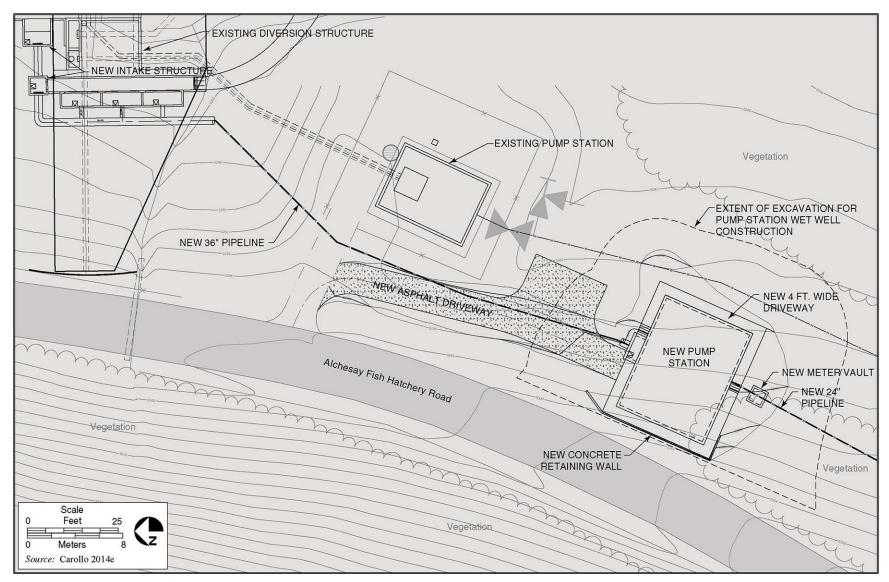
Proposed New Intake Structure and Raw Water Pump Station
